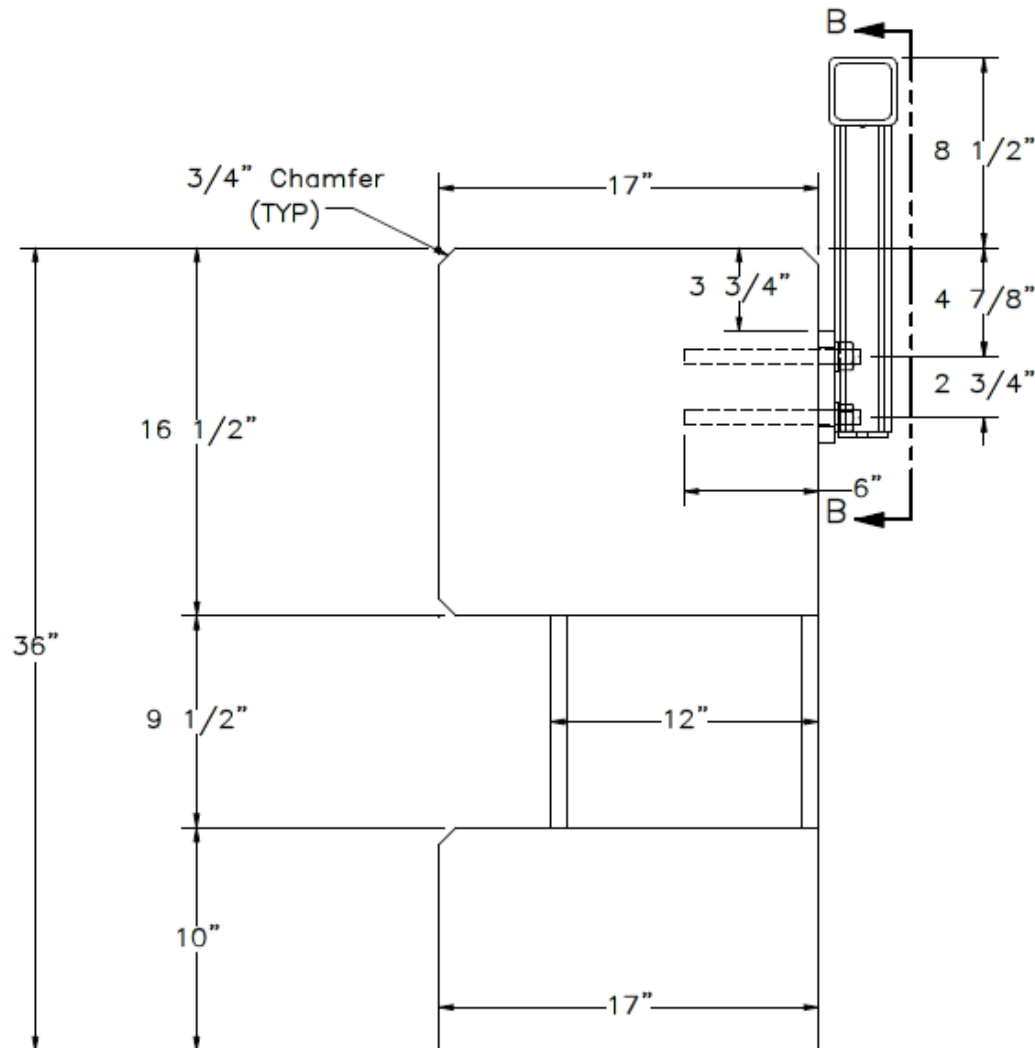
Selected Configuration for Hawaii Concrete Post and Beam Bridge Rail
